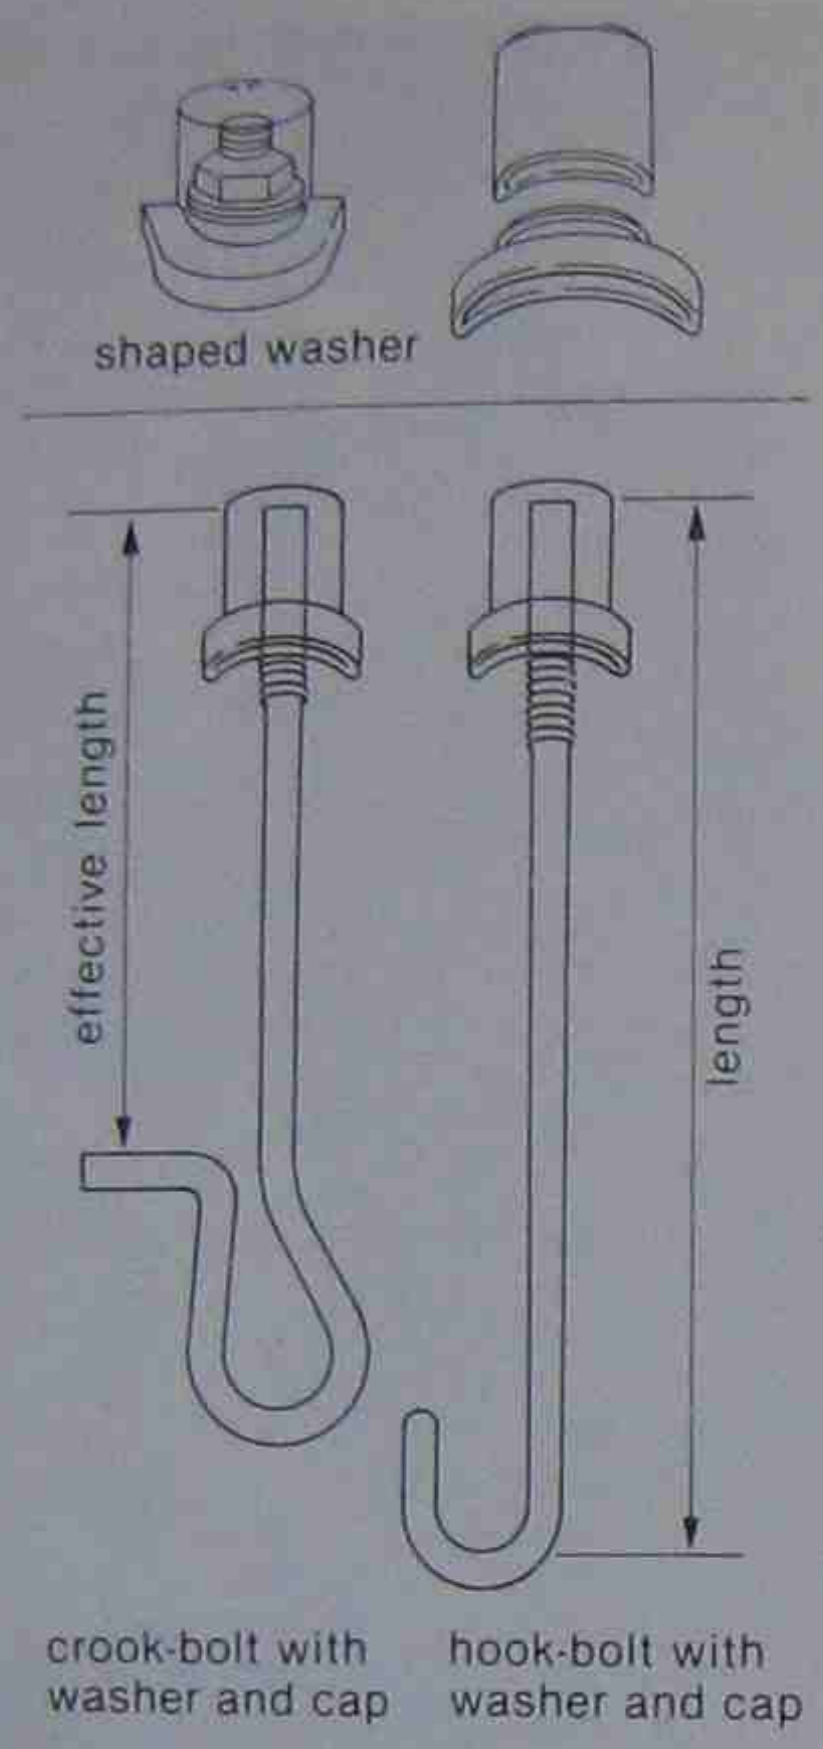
Sheetting hook bolt and waterproofing cap
